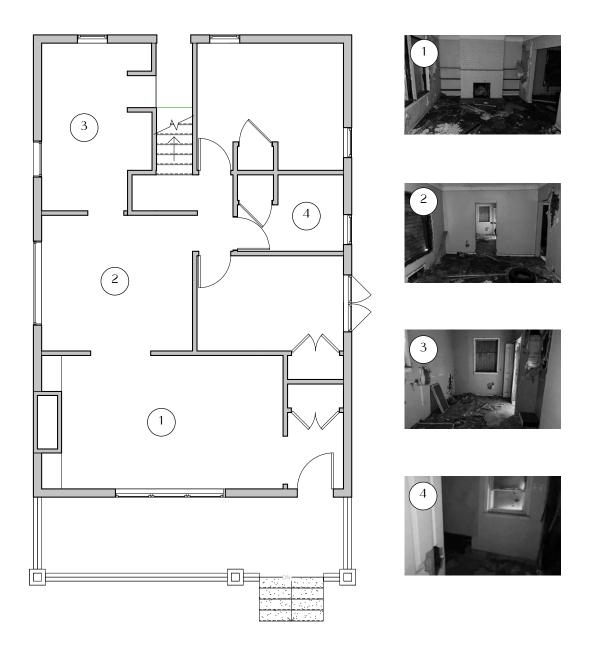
Existing First Floor Plan, scale 1/8"=1'
